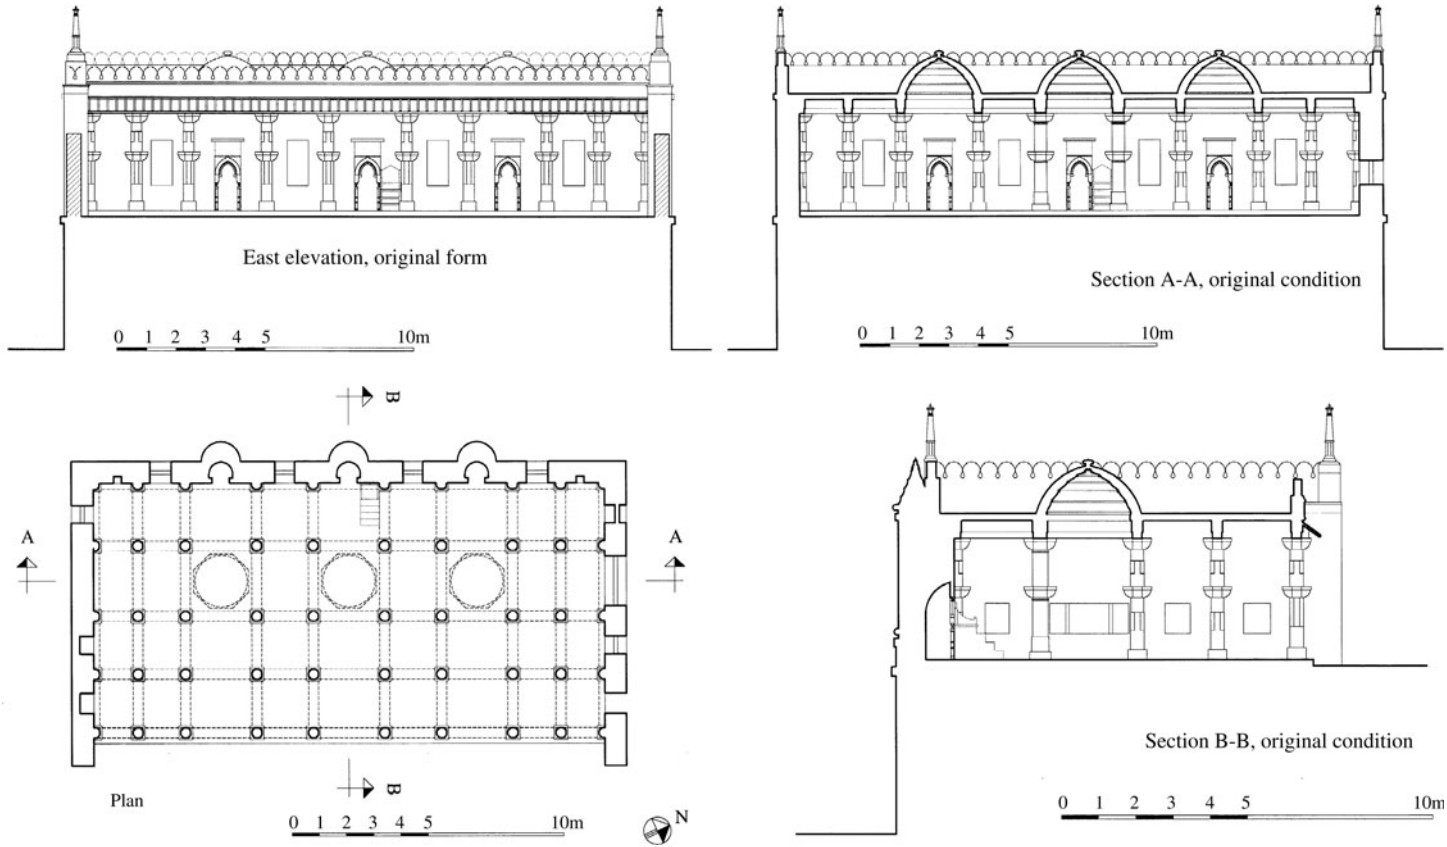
Chaugān Masjid, prayer hall, plan, eastern elevation and sections through and across the hall. The structure is presented in its original condition and later alterations, including arches on the elevation, are omitted.
